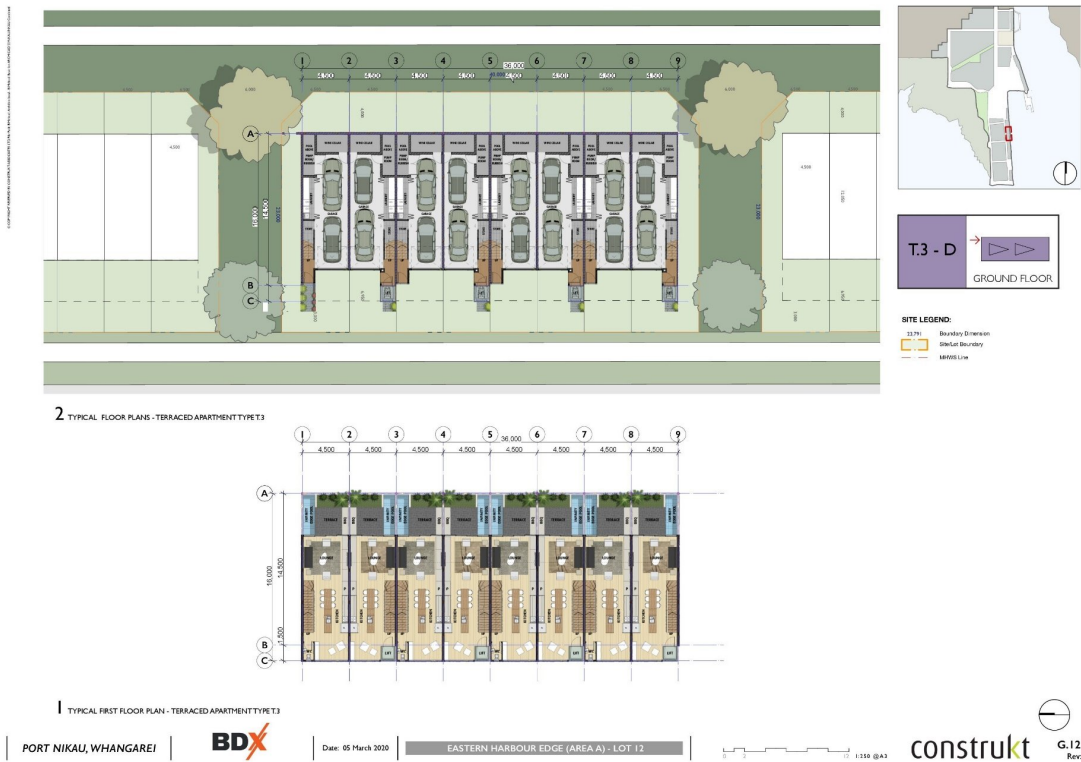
Part G – Eastern Harbour Edge (Area A) Floor Plans
